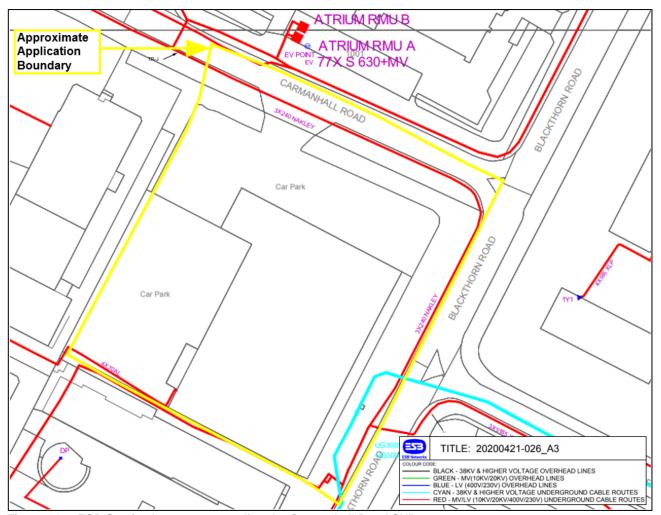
ESB Service Layout surrounding the Carmanhall Road SHD.
